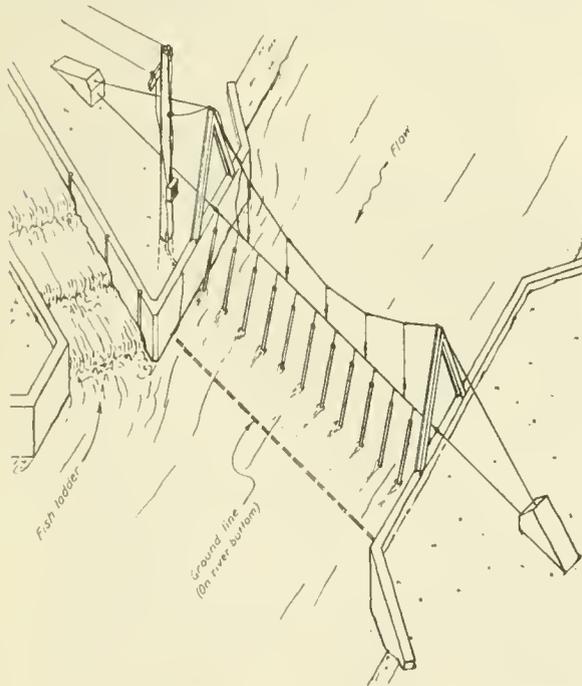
Perspective drawing of idealized electrical weir installation with concrete abutments to constrict river flow. Fish ladder at left leading to retaining area.
